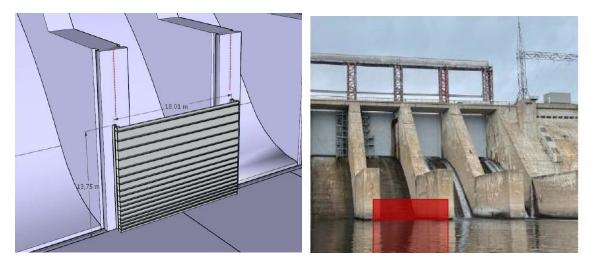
Proposed stop log and steel bulkhead at spillway/sluiceway piers
